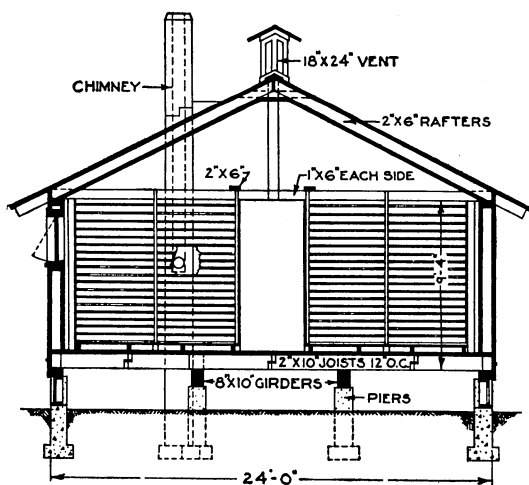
Cross section of a sweet-potato storage house, size 24 by 59½ feet, having a capacity of 4,000 bushels in crates or 5,200 bushels in bulk, showing the arrangement of bins and other structural details
